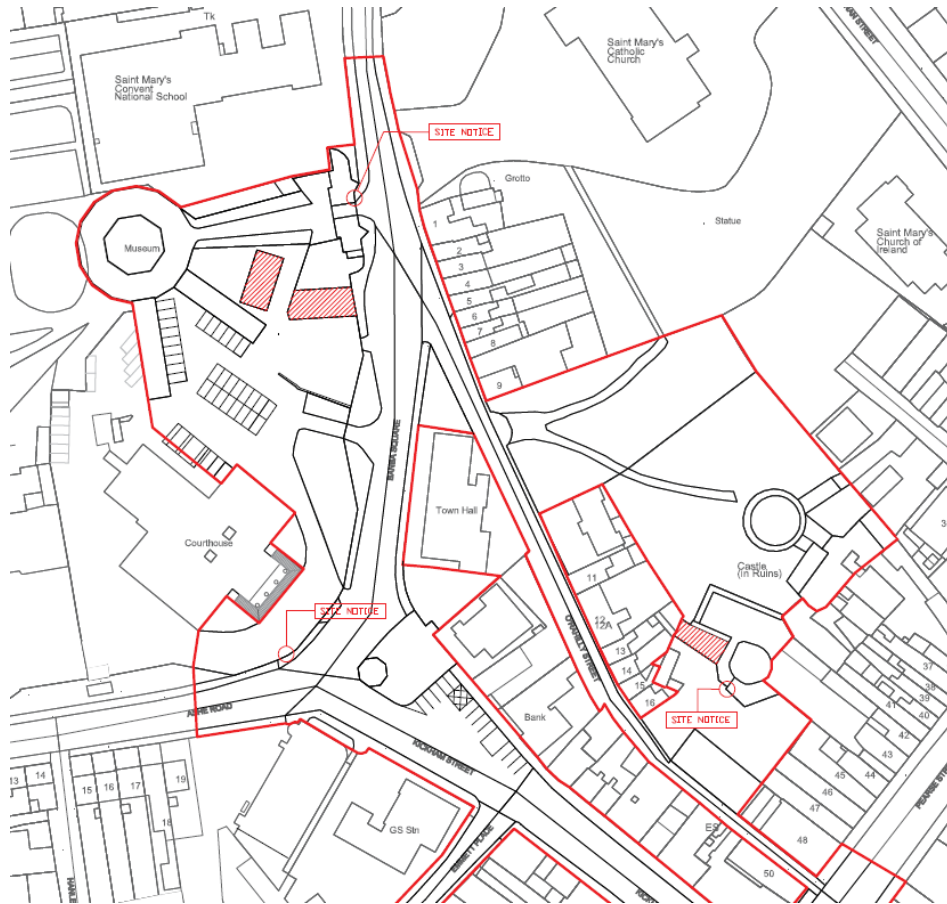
Site location plan showing three buildings proposed for demolition hatched in red, site boundary denoted by red line. Source: Scott Tallon Walker
